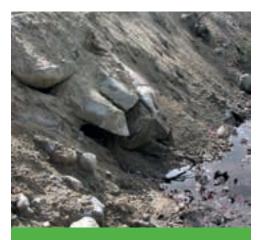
Erosion from road embankments can block culverts and impede water movement.
